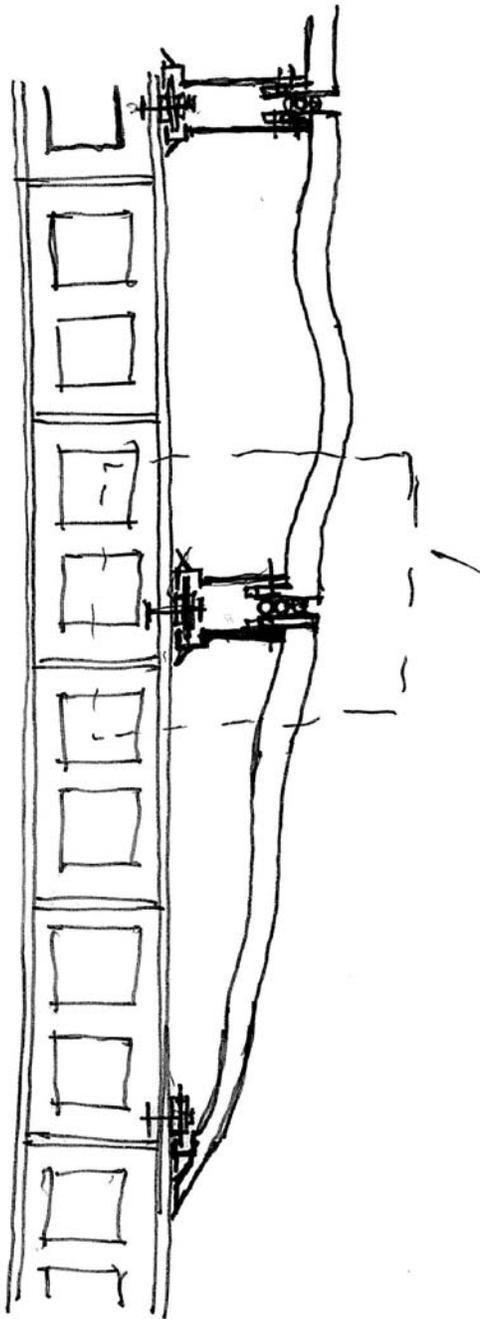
(Faulkner) Sketch of Inert Wall Mount
